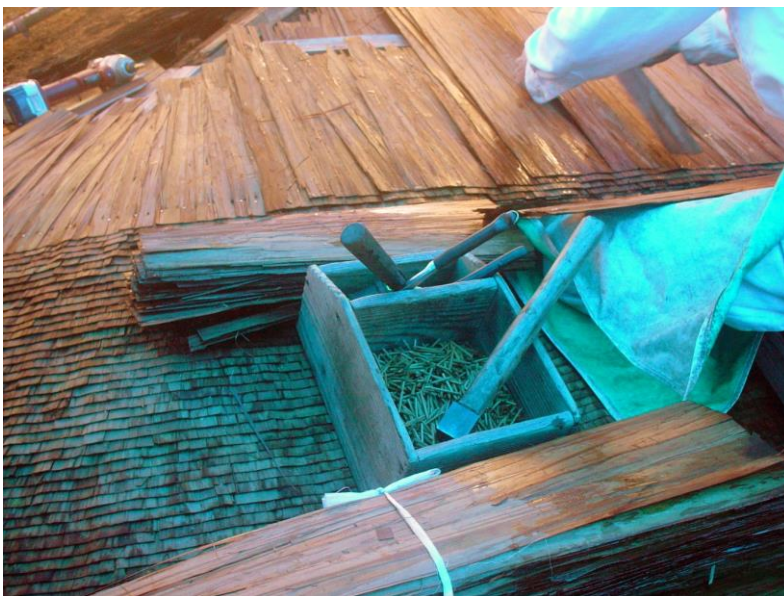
Bamboo nails used to roof with cypress bark shingles
